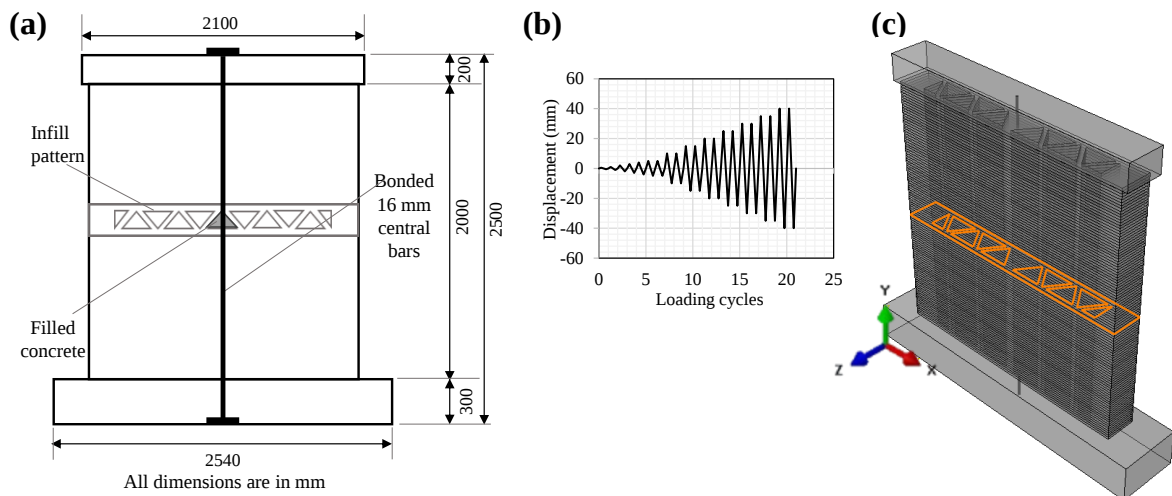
(a) Section detailing with infill pattern; (b) cyclic loading protocol; (c) elevation of the 3DPC wall.
